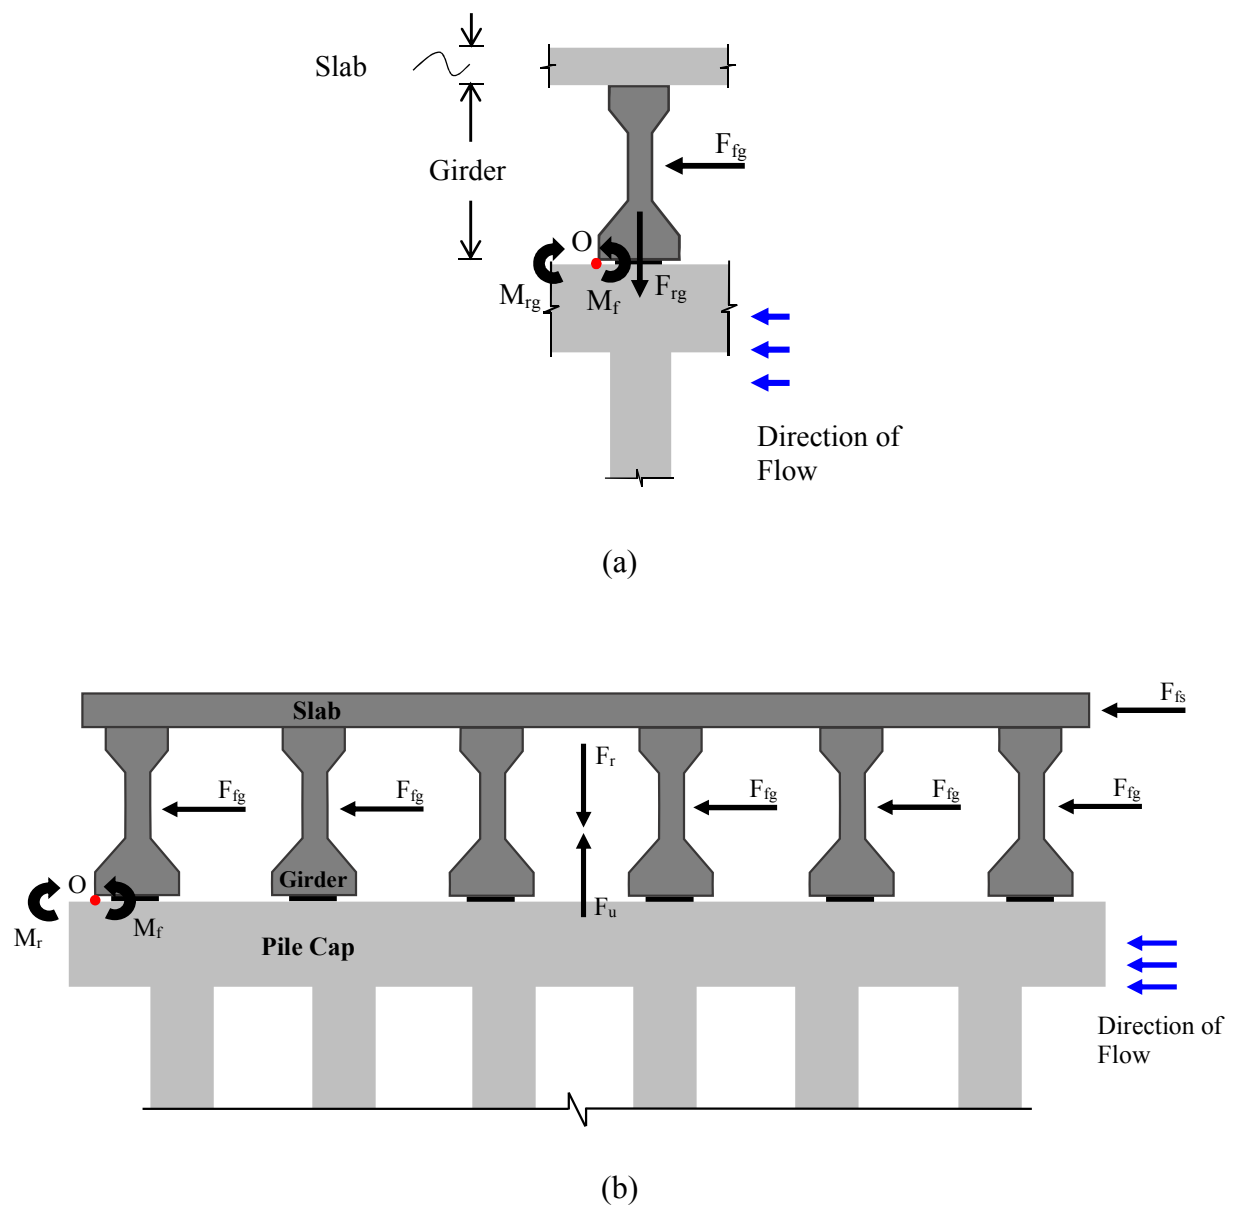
Bridge superstructure cross-section (a) single girder (b) entire girders
